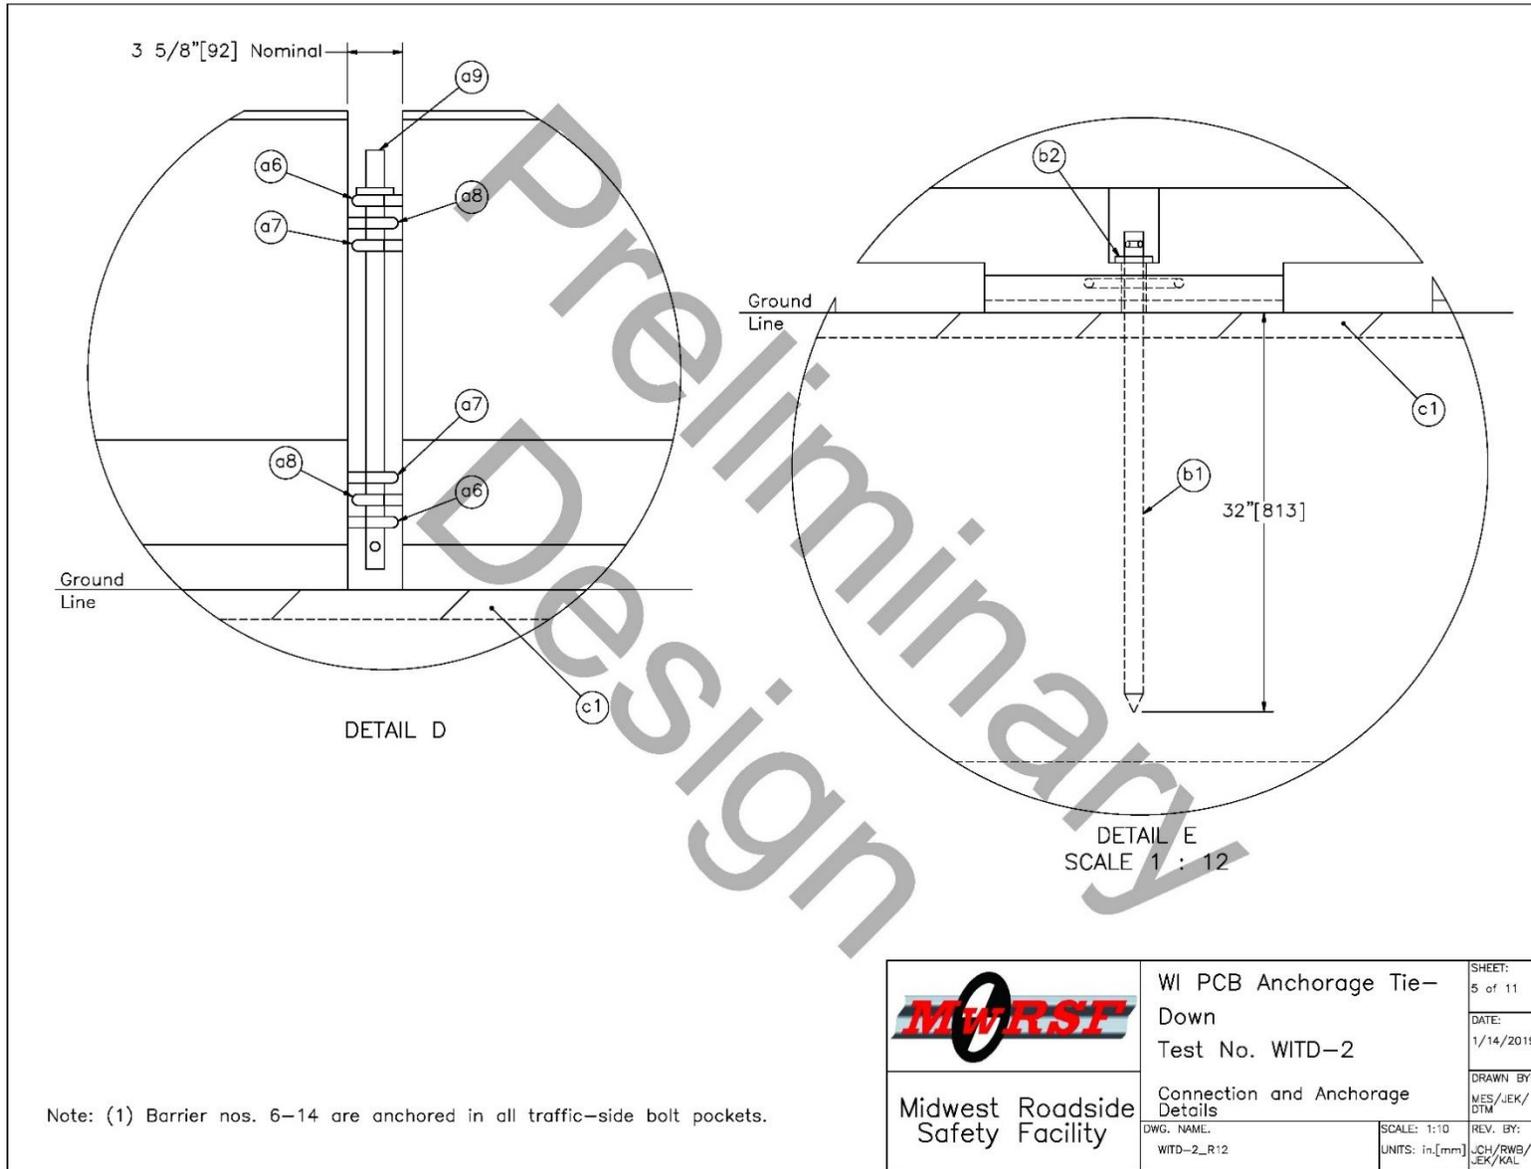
Connection and Anchorage Details, Test No. WITD-2
